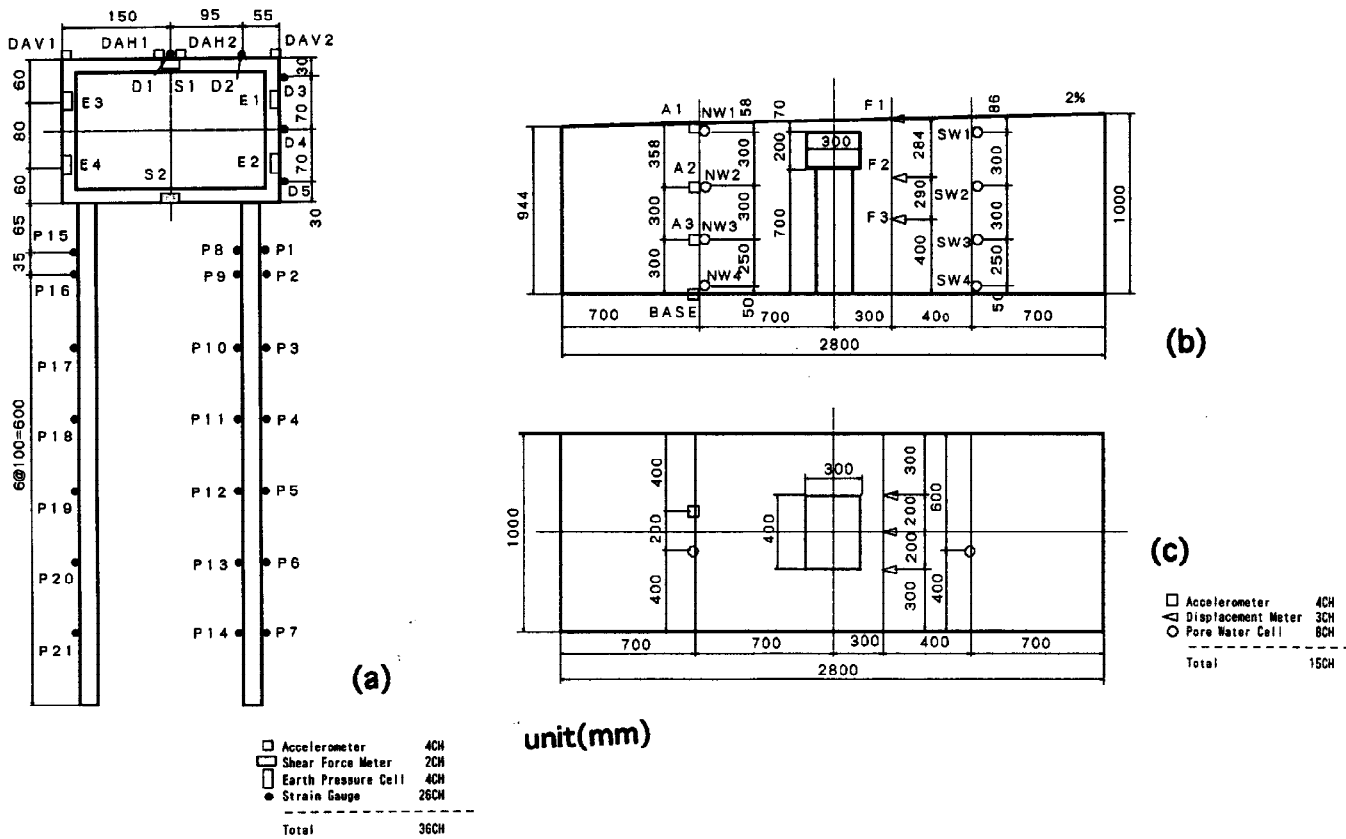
Measured points arrangement (a) Pile and conduit, (b) Sand layer in cross section and (c) Sand layer in plan section
